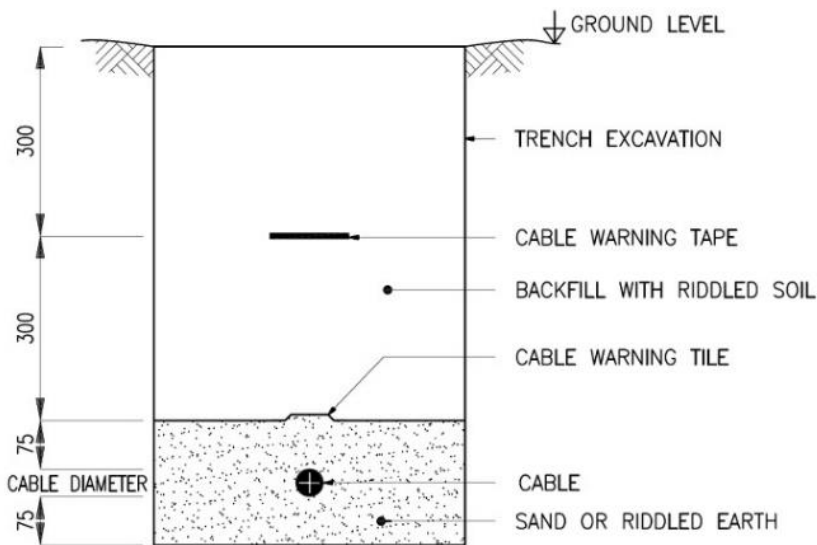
Outdoors, the cable must be buried in a ditch with a PVC or PE sheath to prevent mechanical damage.
